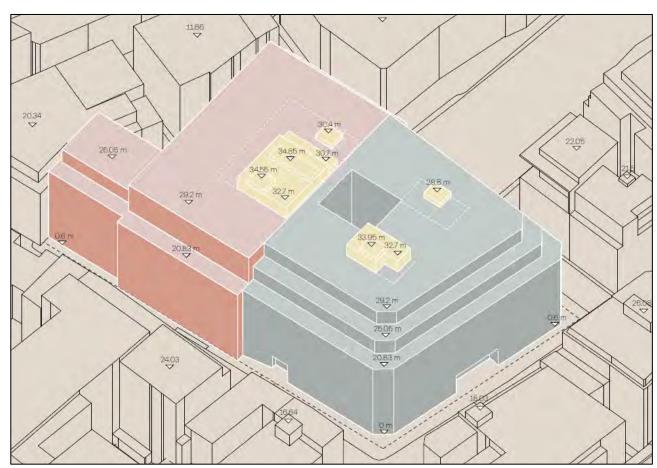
The 'spot heights' of the proposed building. The areas marked in yellow denote the parts of the building which exceed 30 metres in height.
